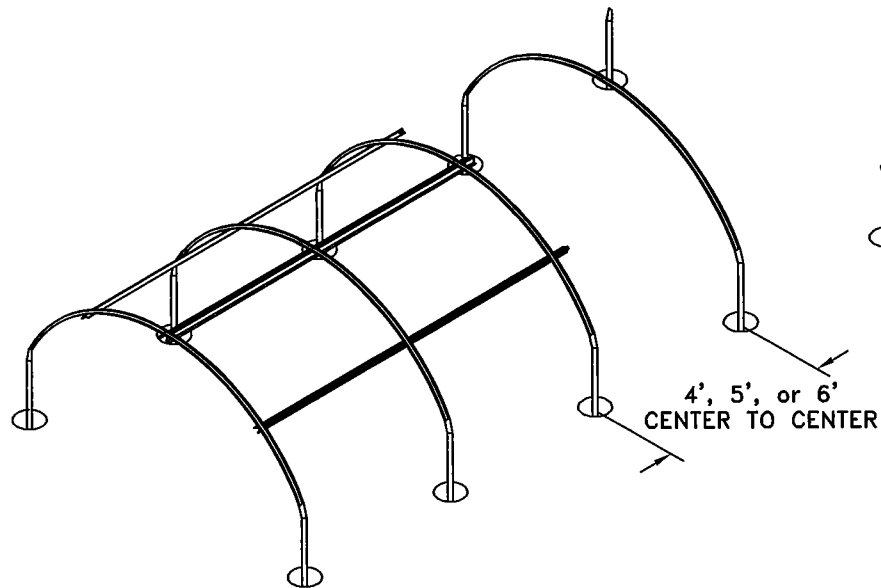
INSTALLING THE REMAINING PURLINS
